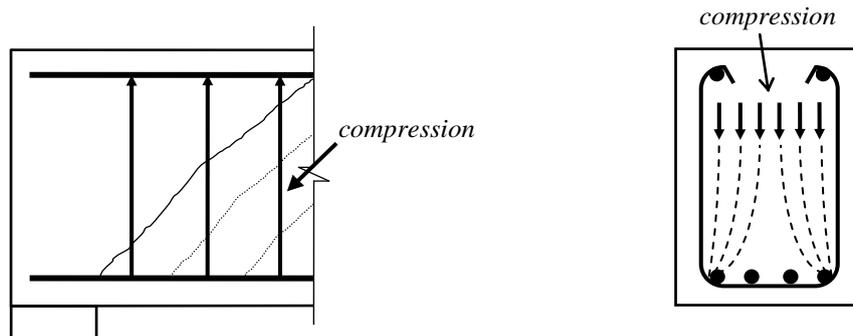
The diagonal compression force flows towards the stirrups legs. Figure is based on Adams *et al.* (2009).
